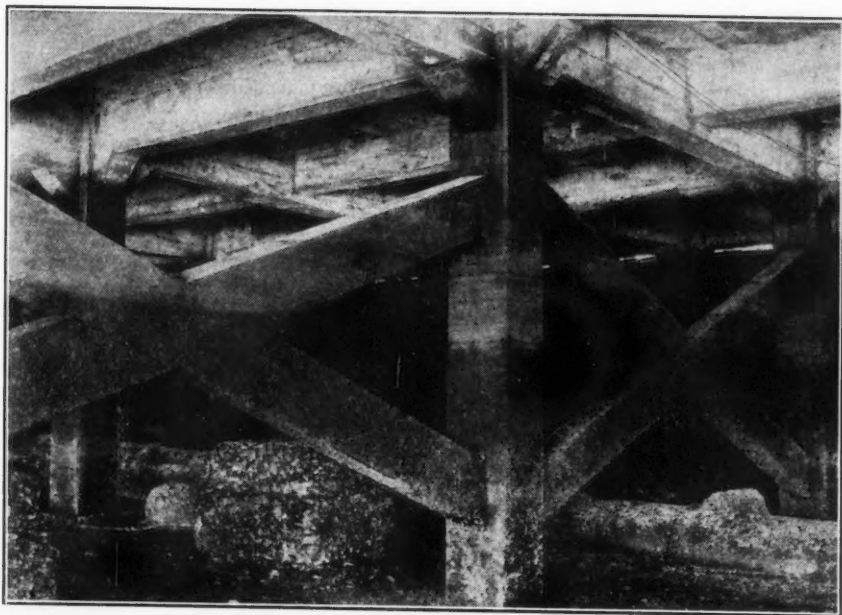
TYPICAL VIEW OF SUBSTRUCTURE OF FERRY PIER, NORTH VANCOUVER, B. C., BUILT IN 1909
